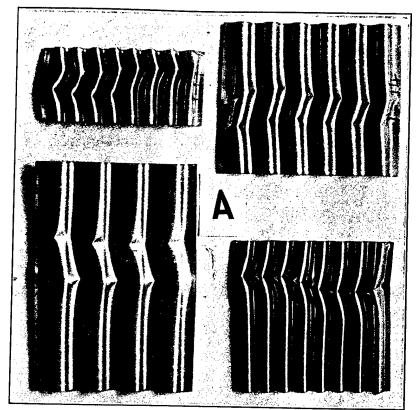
Buckling Failure of Corrugated Sheet.
